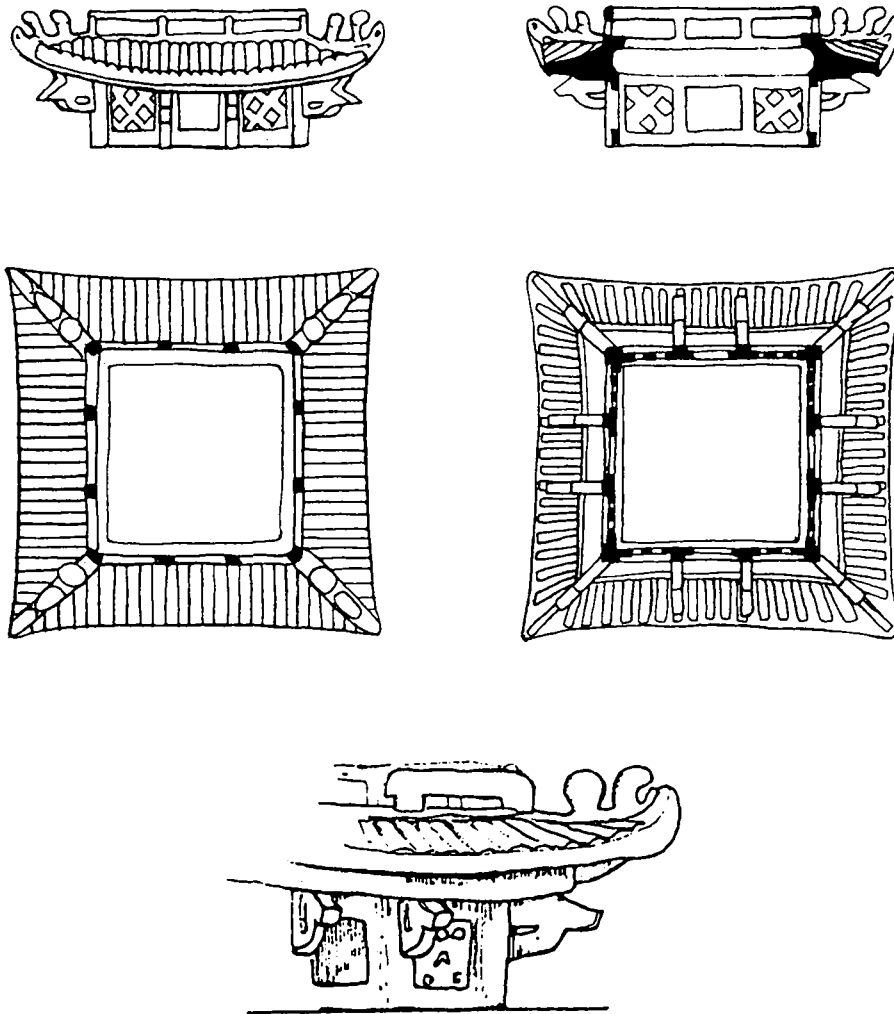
Two plans, elevation and section and partial perspective of the fragment of a bronze pagoda model excavated at Chŏn-wang-sa 天王寺 천왕사 at Bu-yŏ 扶餘 부여 (6th C. AD ?, scale: 1 : 3) (drawings by the author and after: BÆ Byŏng-sŏn 裴秉宣 배병선 (1993), p. 36 (perspective))
